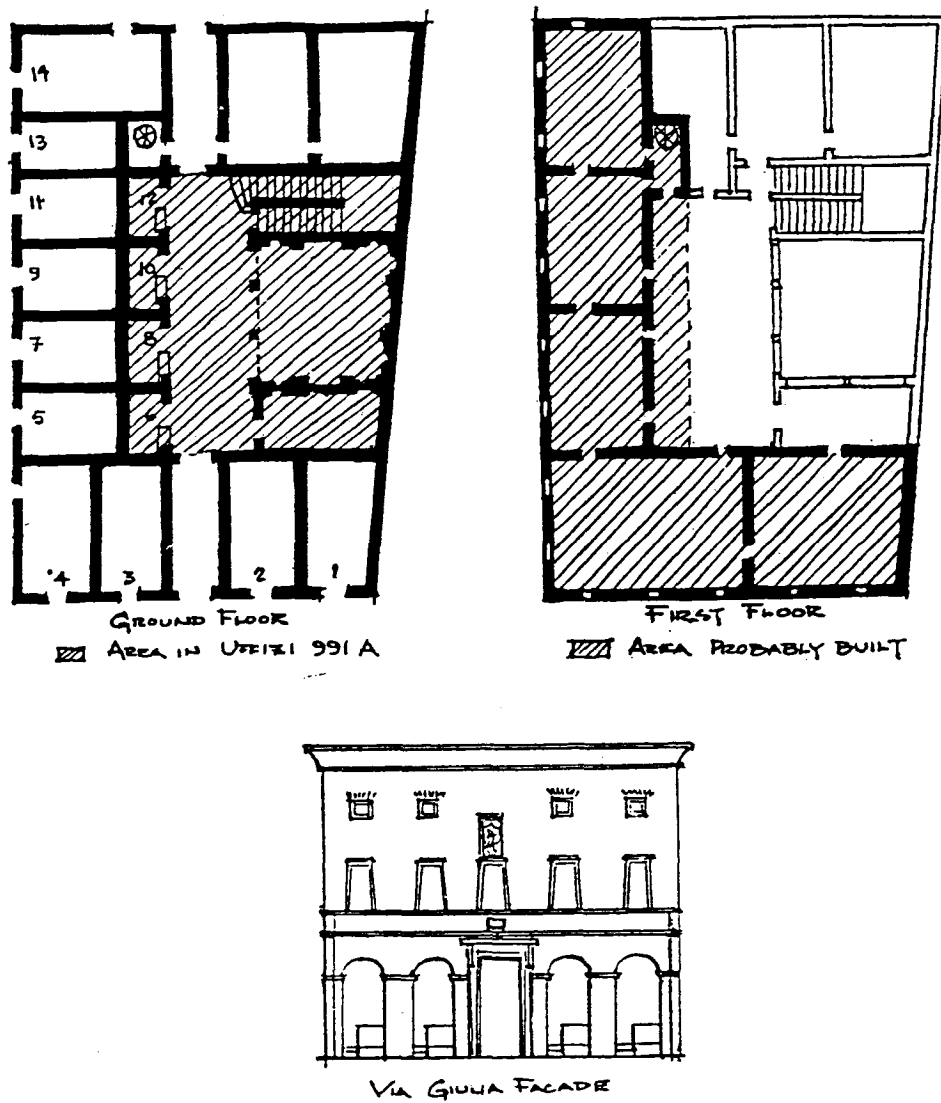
Palazzo Sangallo: reconstruction of original plans and facade (from Andres)
